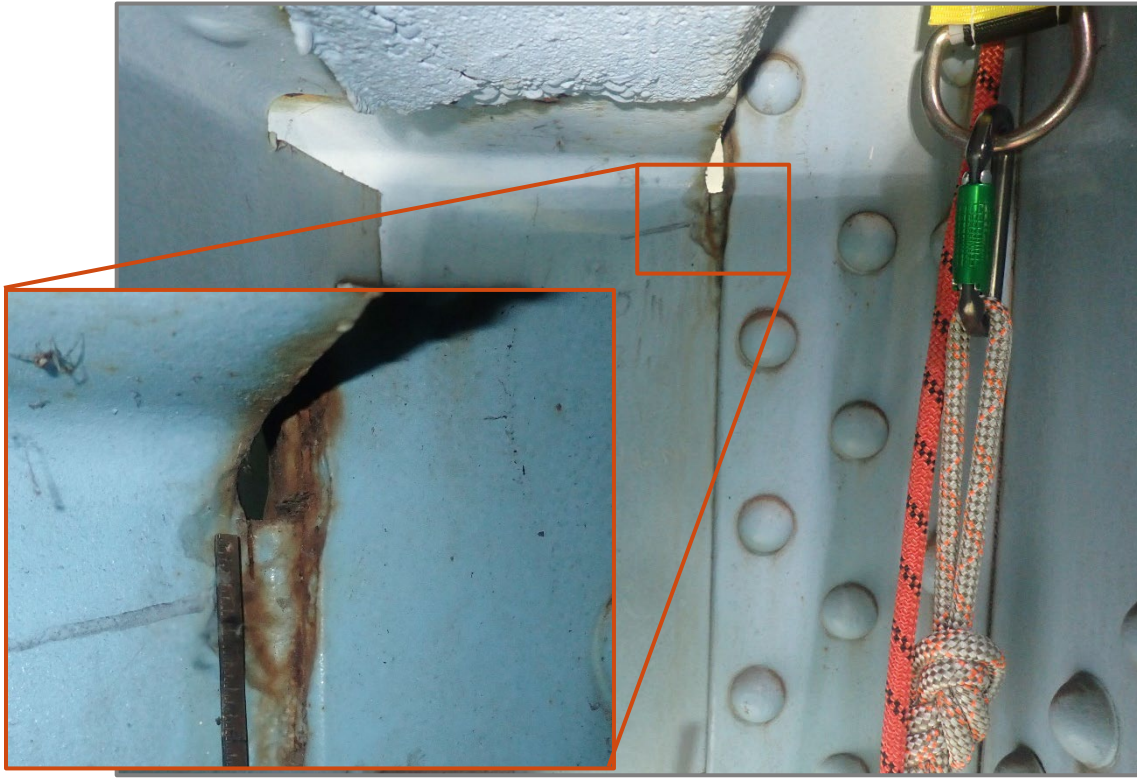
Overcut in a floorbeam web at the upper cope at the connection to the truss
